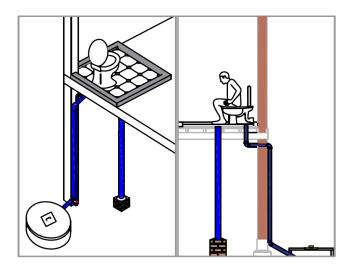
Sky latrine from iDE which will be built to connect to 3C Pit system
